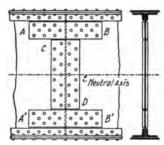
WEB SPLICE FOR PLATE GIRDER.
